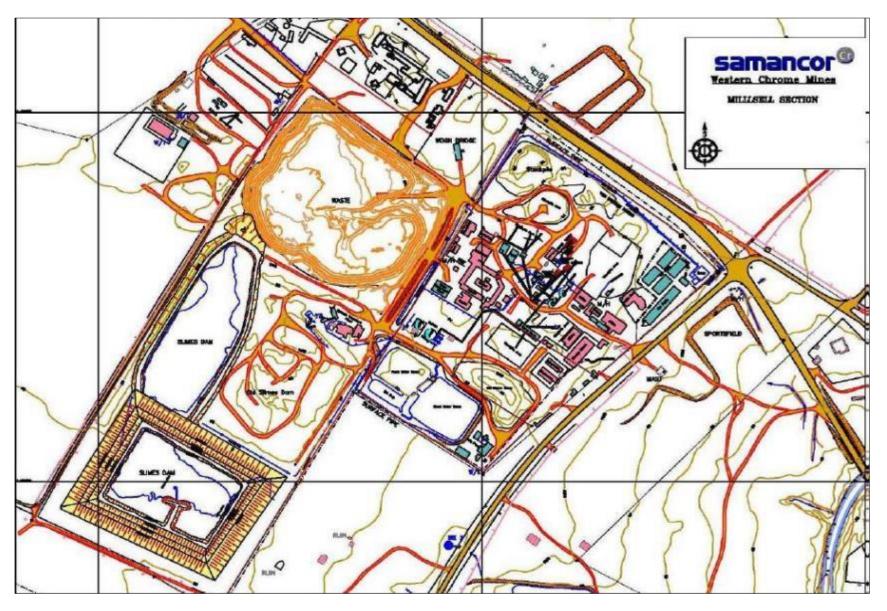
Existing surface layout for the Millsell Section (New Tailings Storage Facility (TSF) not included)
